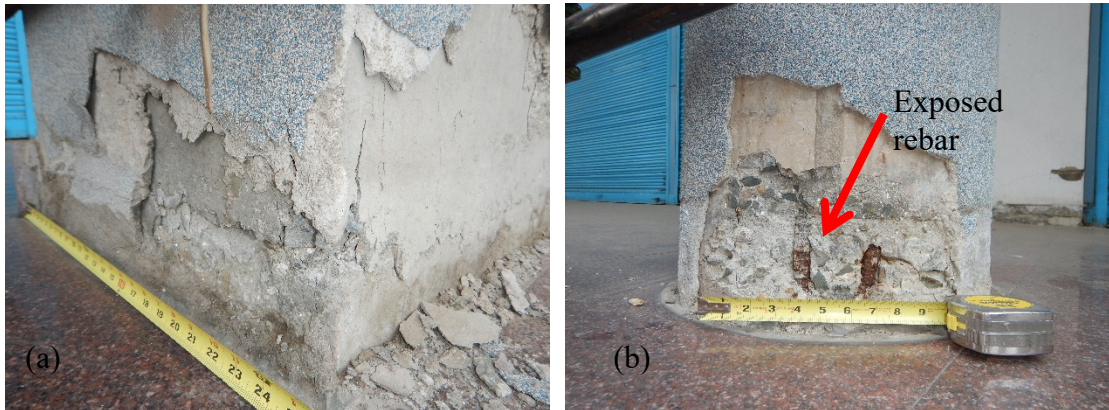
CTC Mall – concrete spalling at column bases: east side of building; (b) north side of building.
